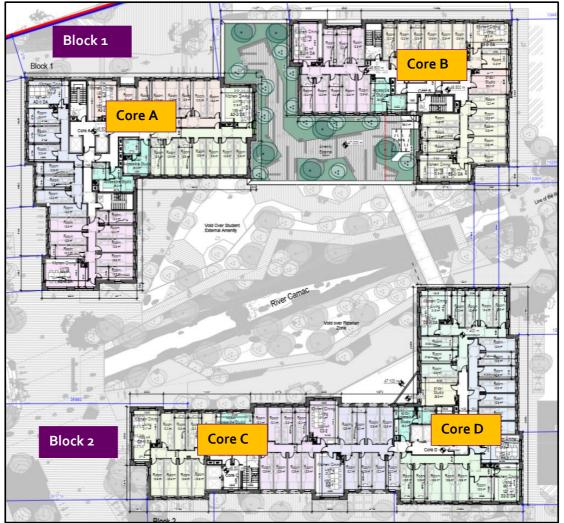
Second Floor Plan Indicating Block 1 with Core A & B and Block 2 with
